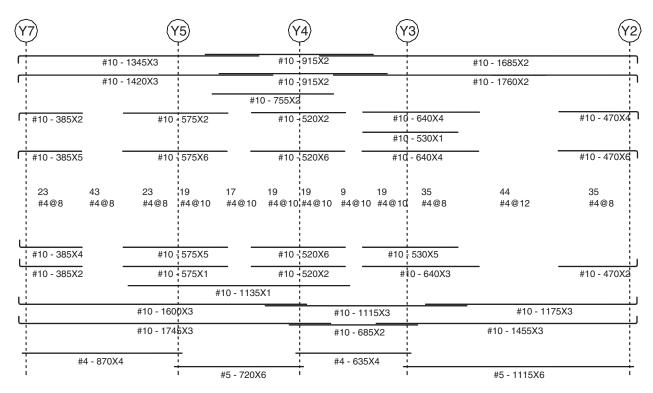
Shop drawing of reinforcements for four-span continuous beam 5FX1B1-B4 (unit: cm)
